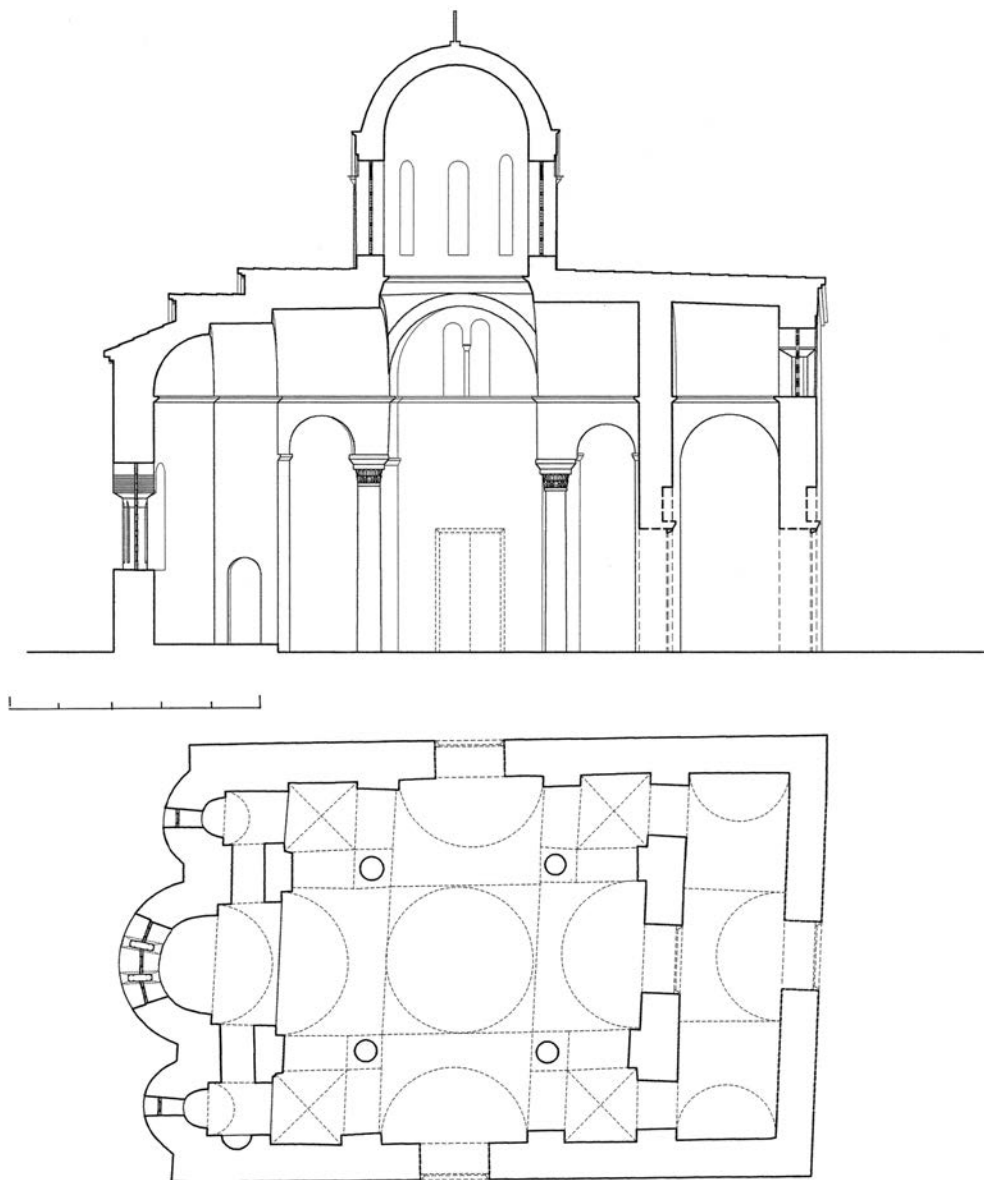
Hagia Aikaterine. Reconstructive plan and longitudinal section. Drawing by S. Mamaloukos.
